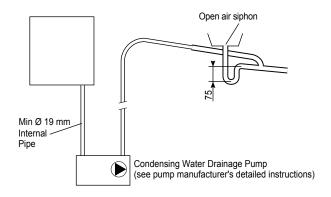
Typical Connection Method of a Condensing Water Drainage Pump (see pump manufacturer's detailed instructions)
